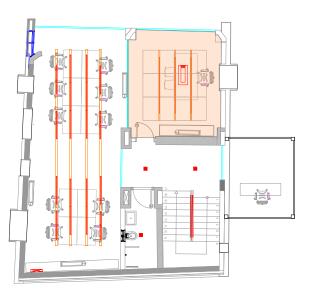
ERKE's Lighting Cell Office Layout in First Floor
